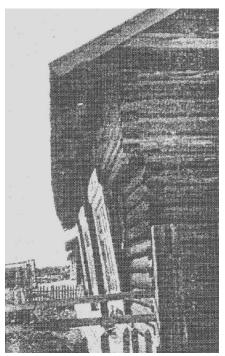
B: Wall damage in the 1958 Kamchatka earthquake (showing a side view of the building)
